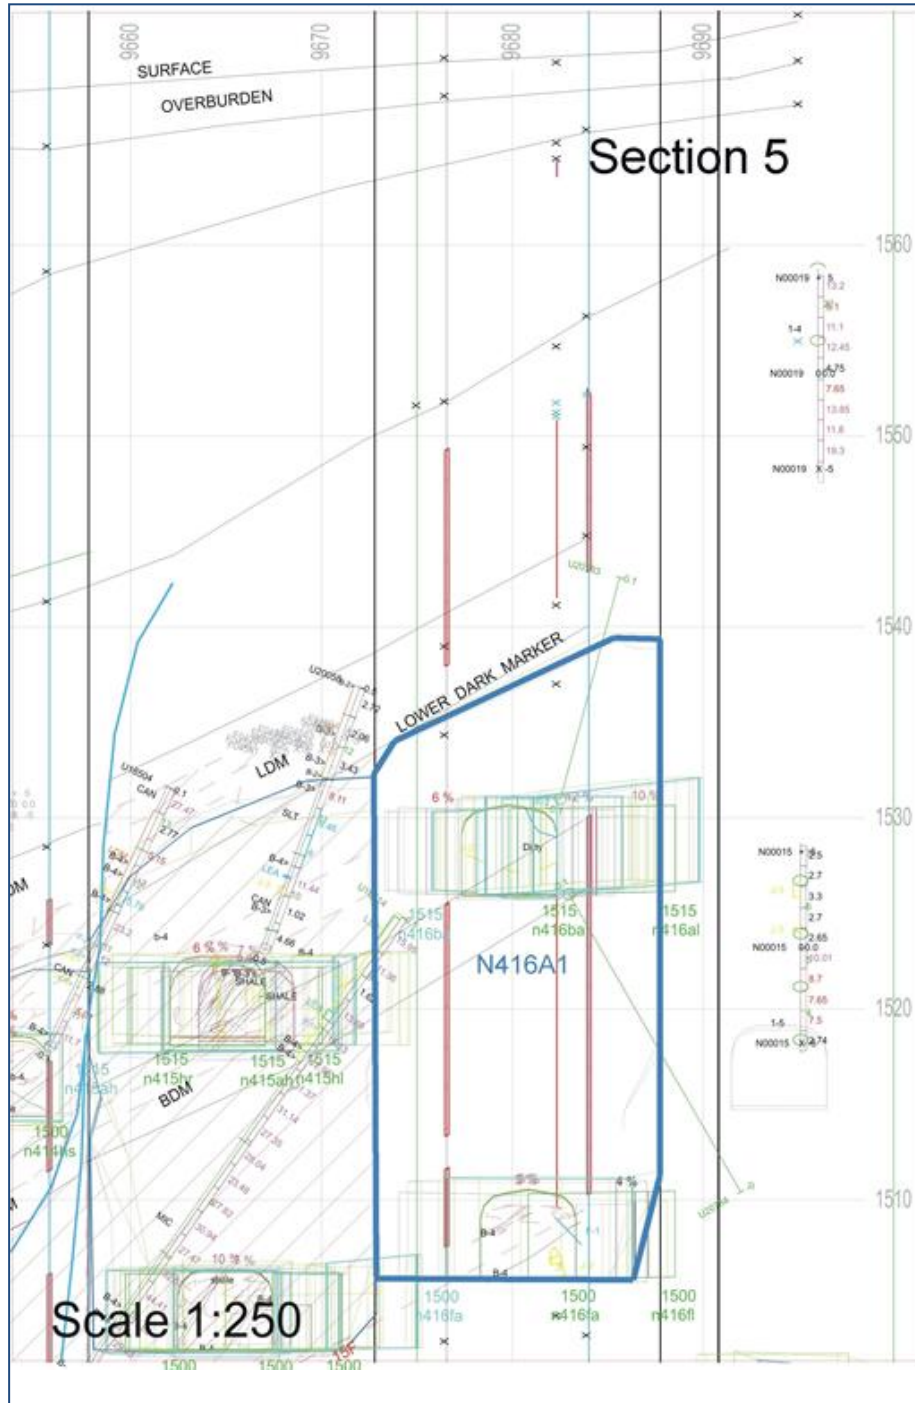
STOPE N416A1 SECTION 5 (FENG, 2008).
